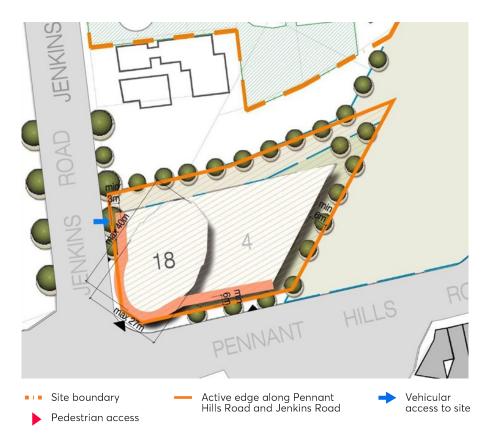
Dimensional Built Form Controls: Block 5 Corner of Pennant Hills Road and Jenkins Road
